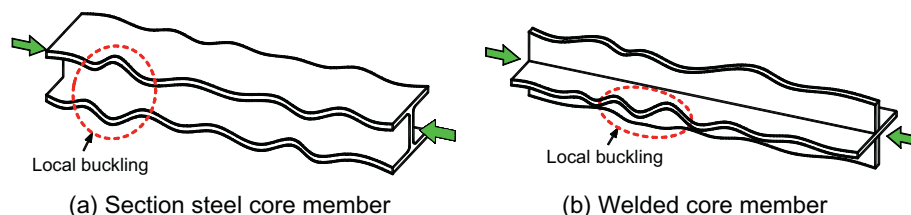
Typical local buckling configurations for section steel and welded core members.
